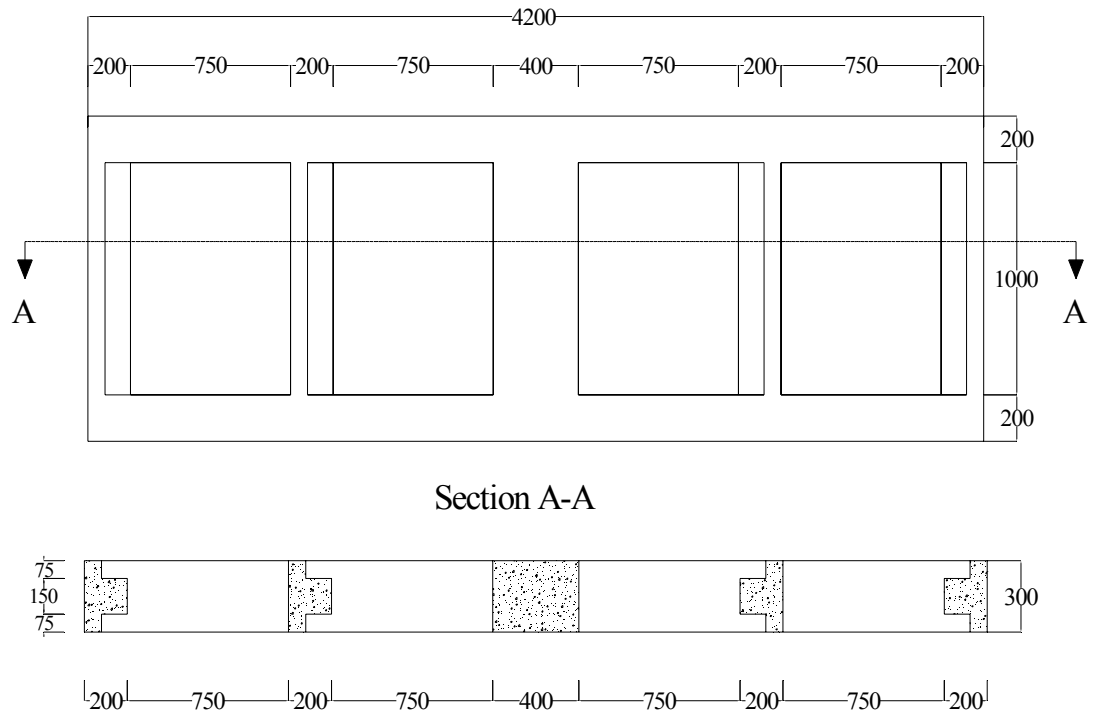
Dimensions of the Test Specimens (dimensions in mm)
